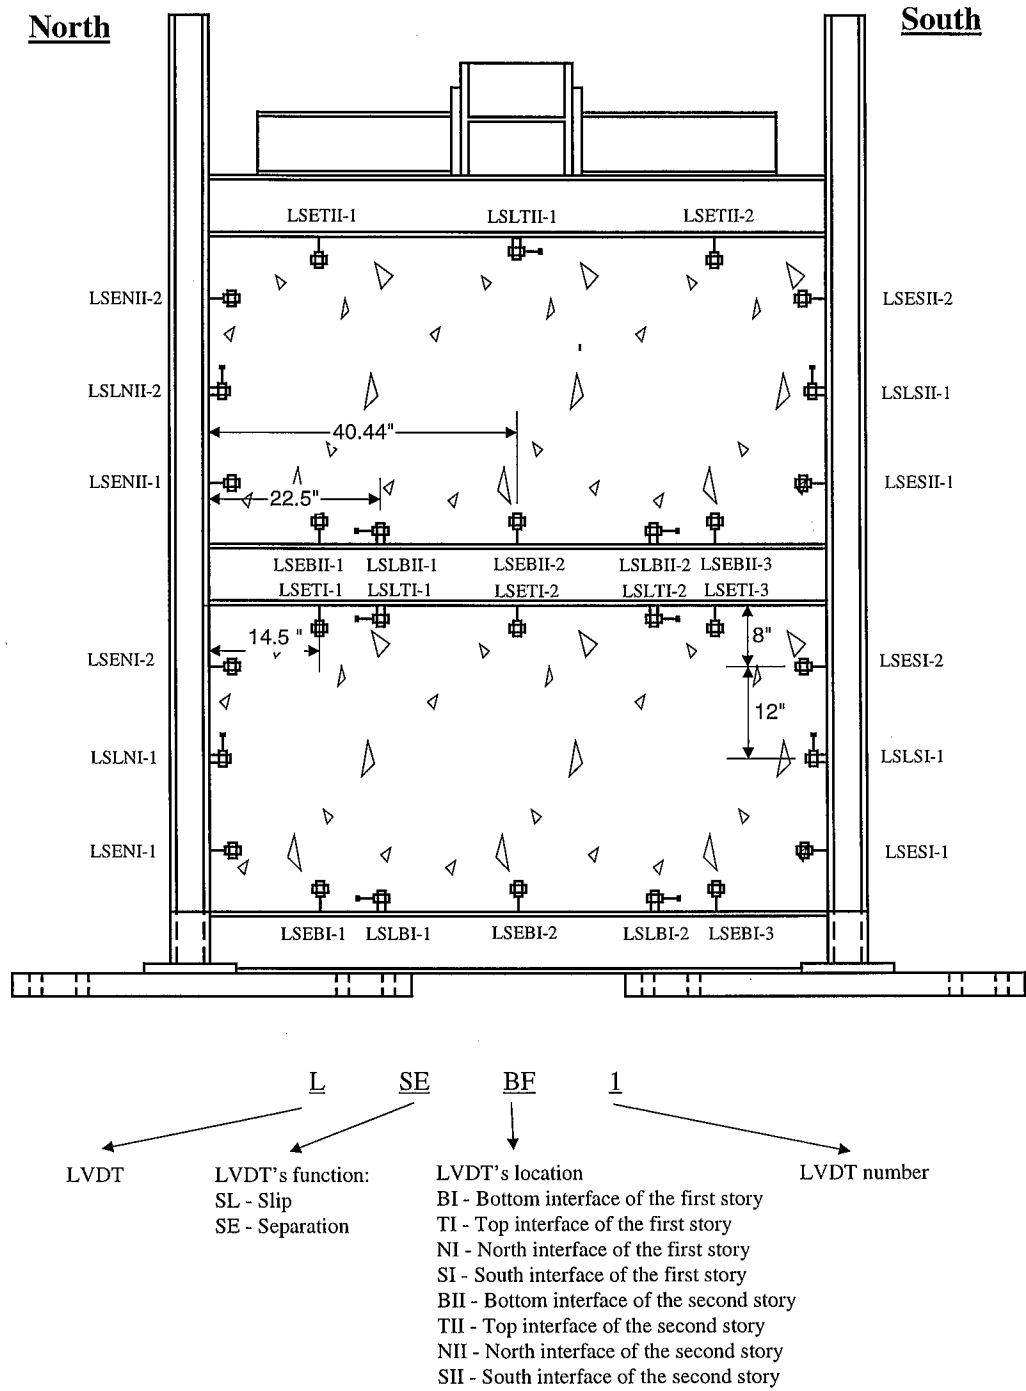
Instrumentation Plan: LVDTs along the Interfaces between the Steel Members and RC Walls
